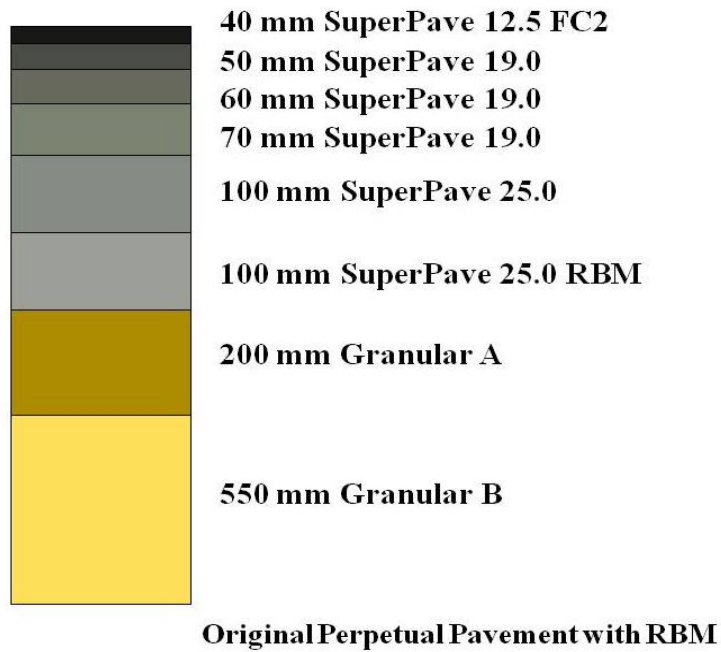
Pavement One: Perpetual Pavement Section with RBM
